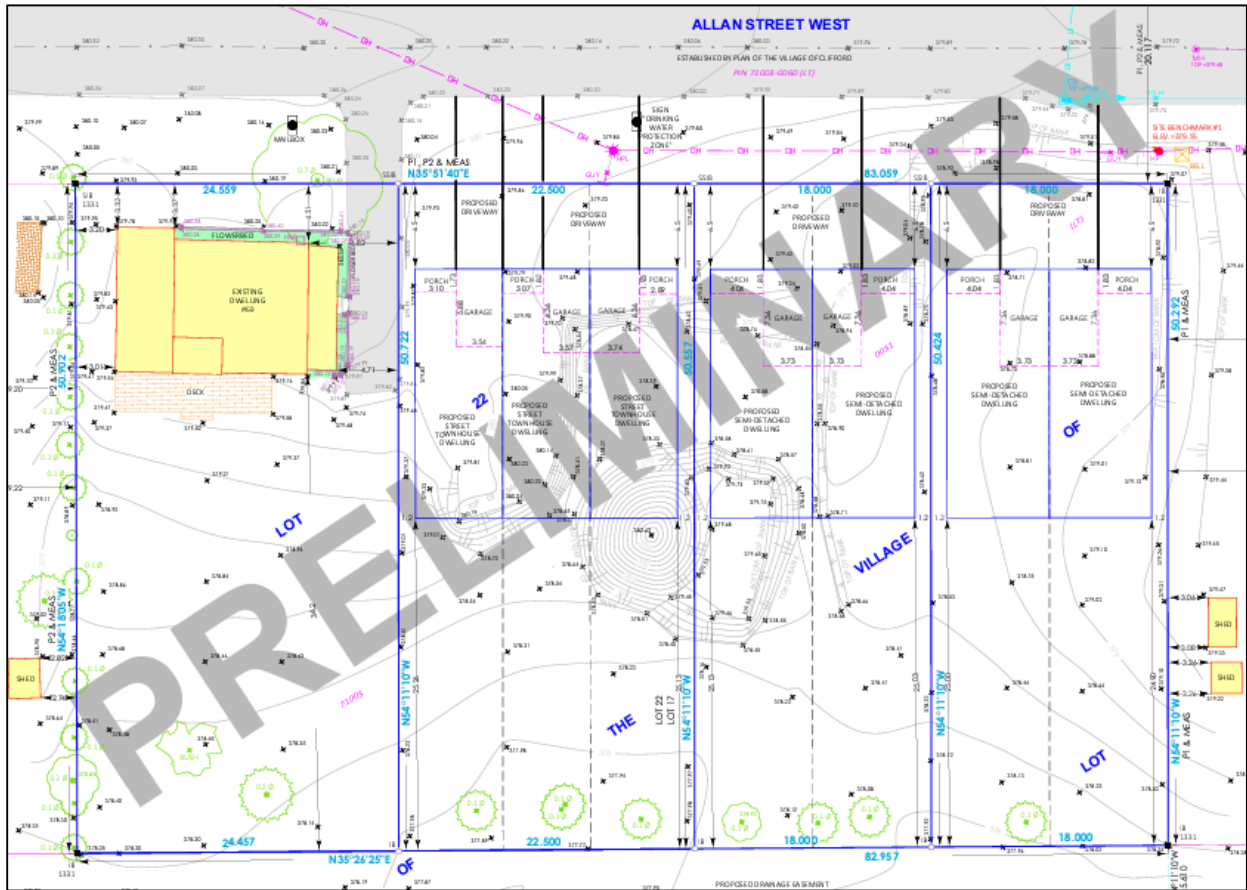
Site Plan submitted by Van Harten Surveying Inc. February 2024
